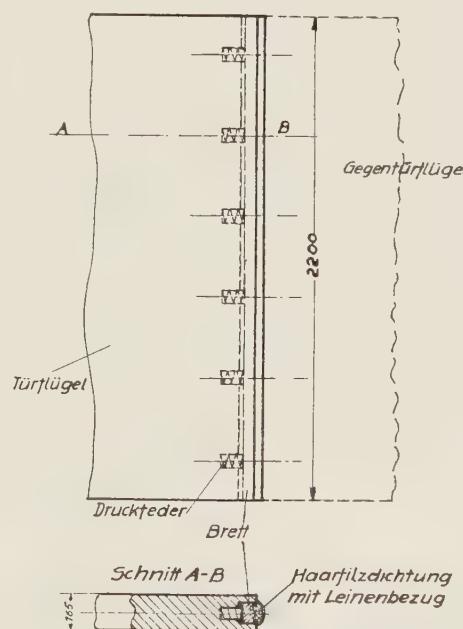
Sealing of door by means of spring loaded packing piece (« springboard »).
